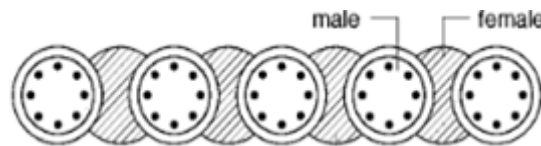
Typical secant pile wall arrangement with female(primary) and male(secondary) piles forming hard/soft wall after Suckling et al. (2005).
